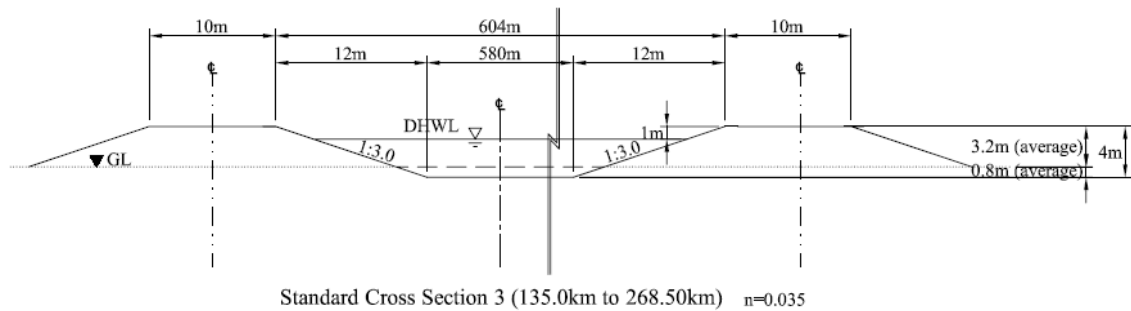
Standard Cross Section of East Diversion Channel with Slope Protection (135km to Diversion Point)
